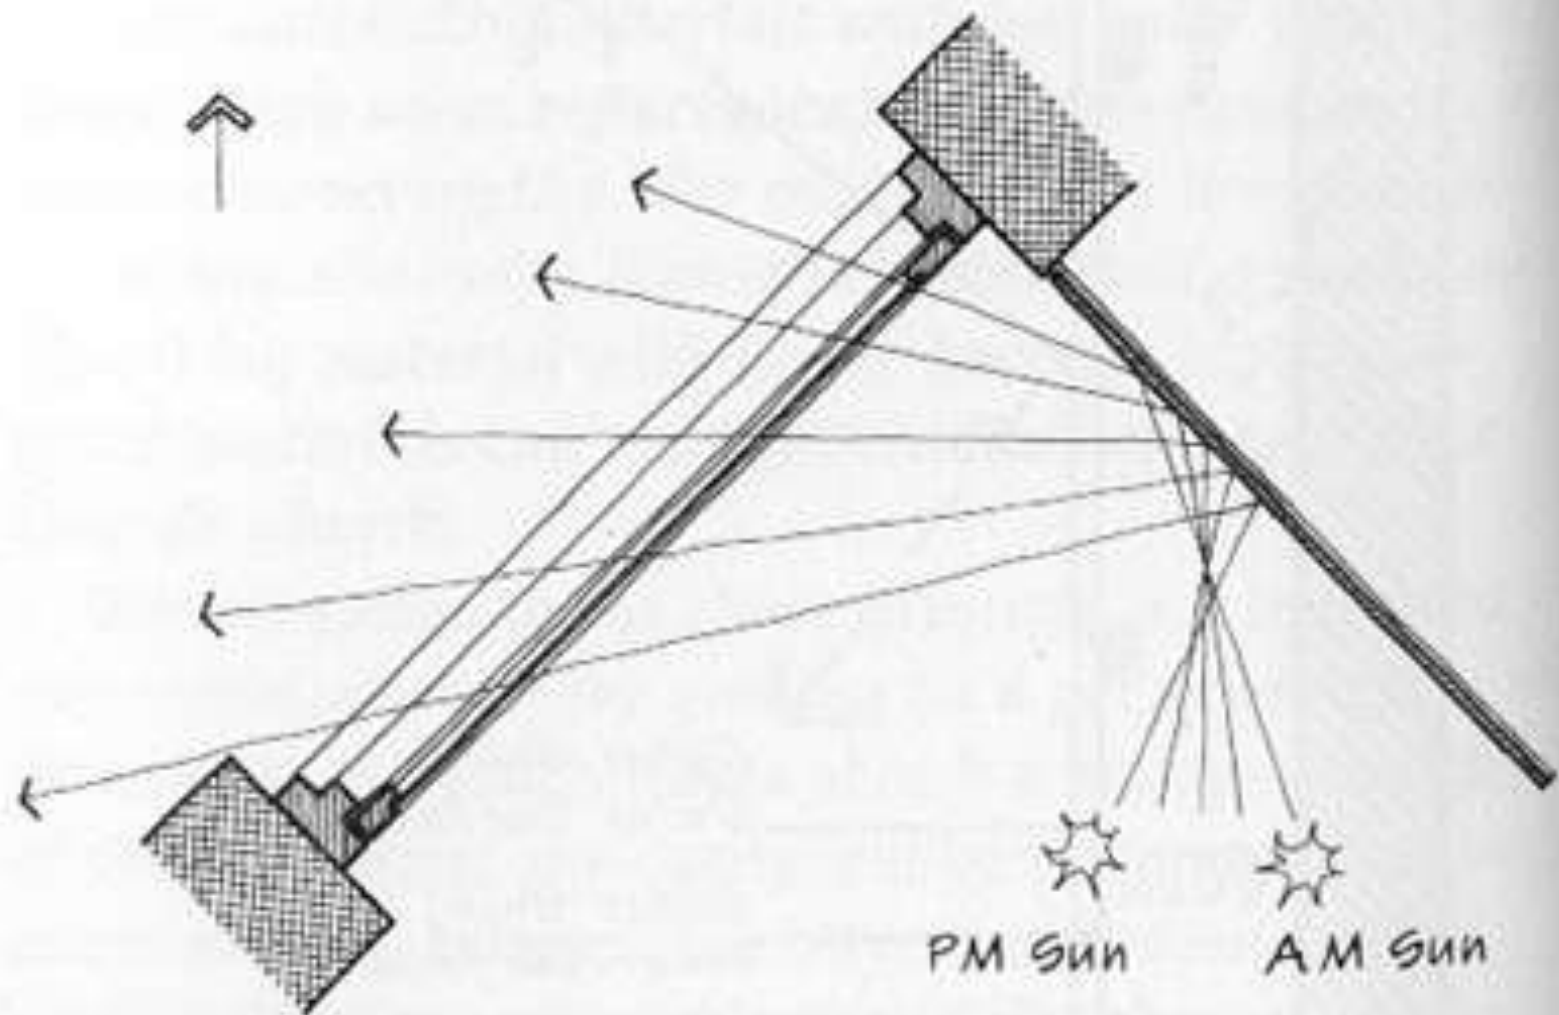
When windows must be placed in north, west and east walls, keep the opening small, and use internal placement to best advantage.
